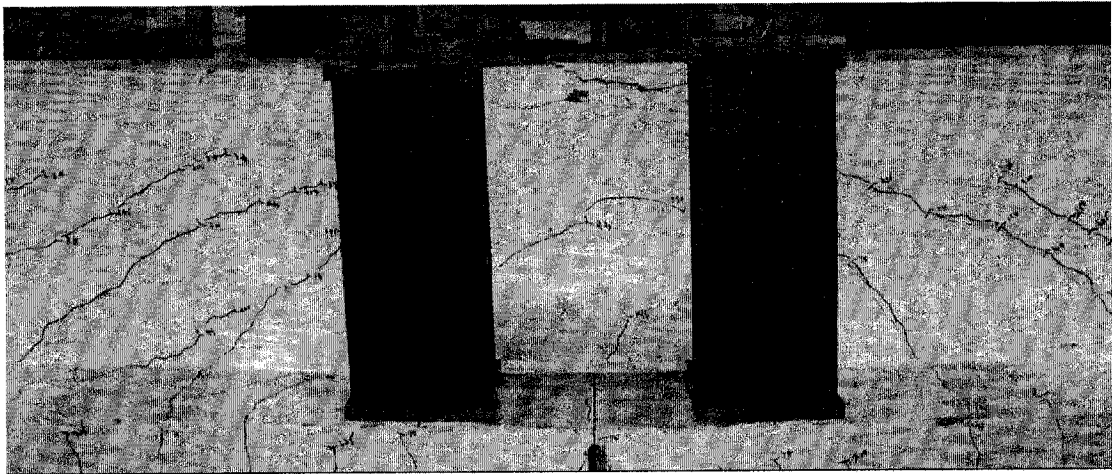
Hanger failure (girder IT-G2)
